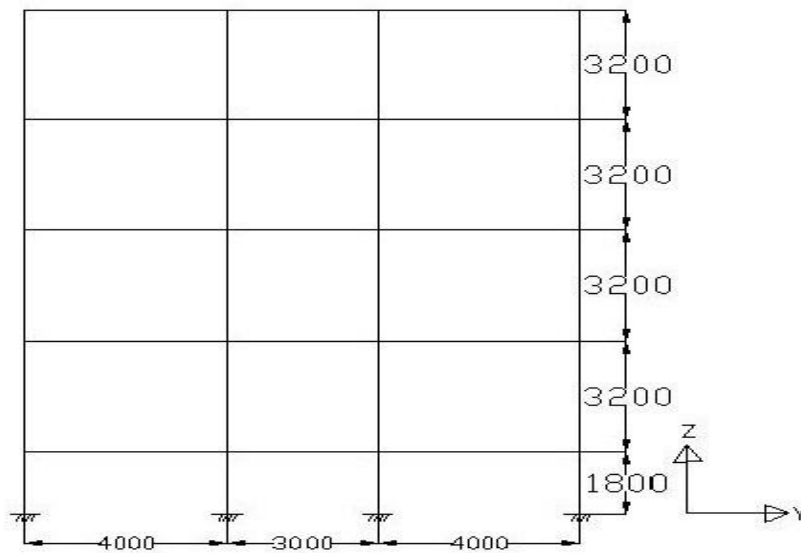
TYPICAL Y FACE ELEVATION OF MODELS
